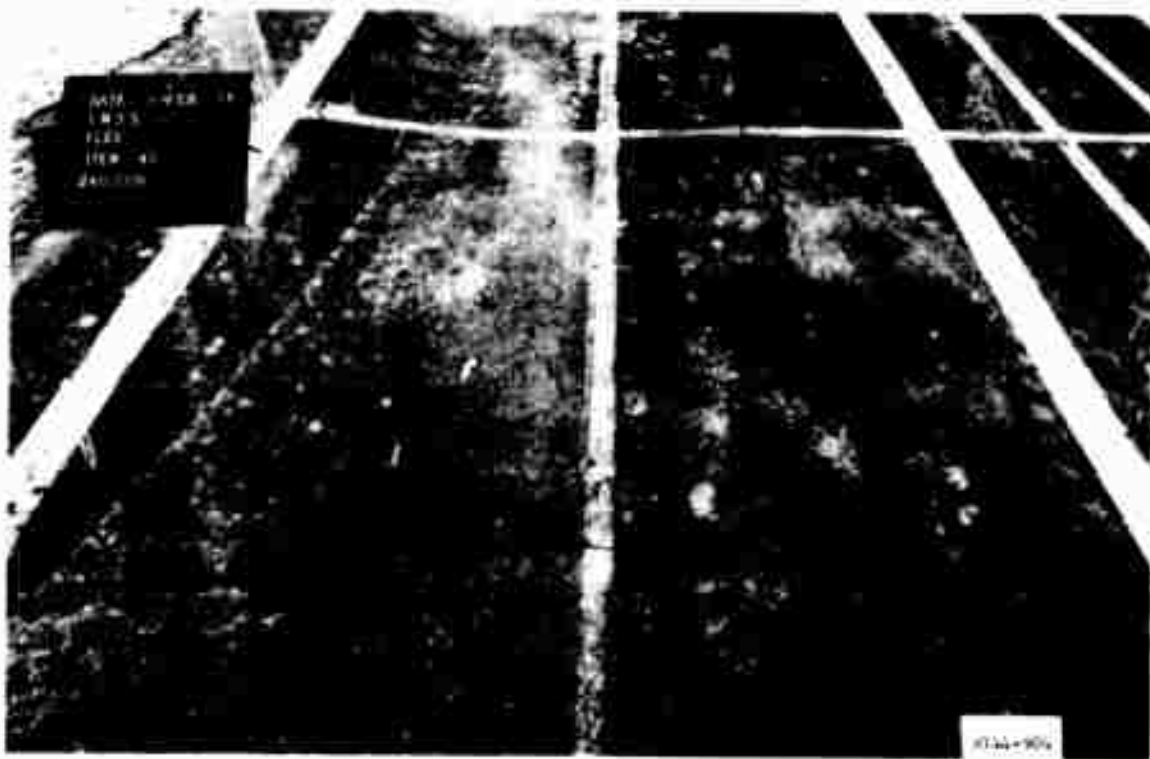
Cracking in subitem 4c, lane 3, flexible pavement test section, at failure after 240 coverages of 50-kip single-wheel assembly
